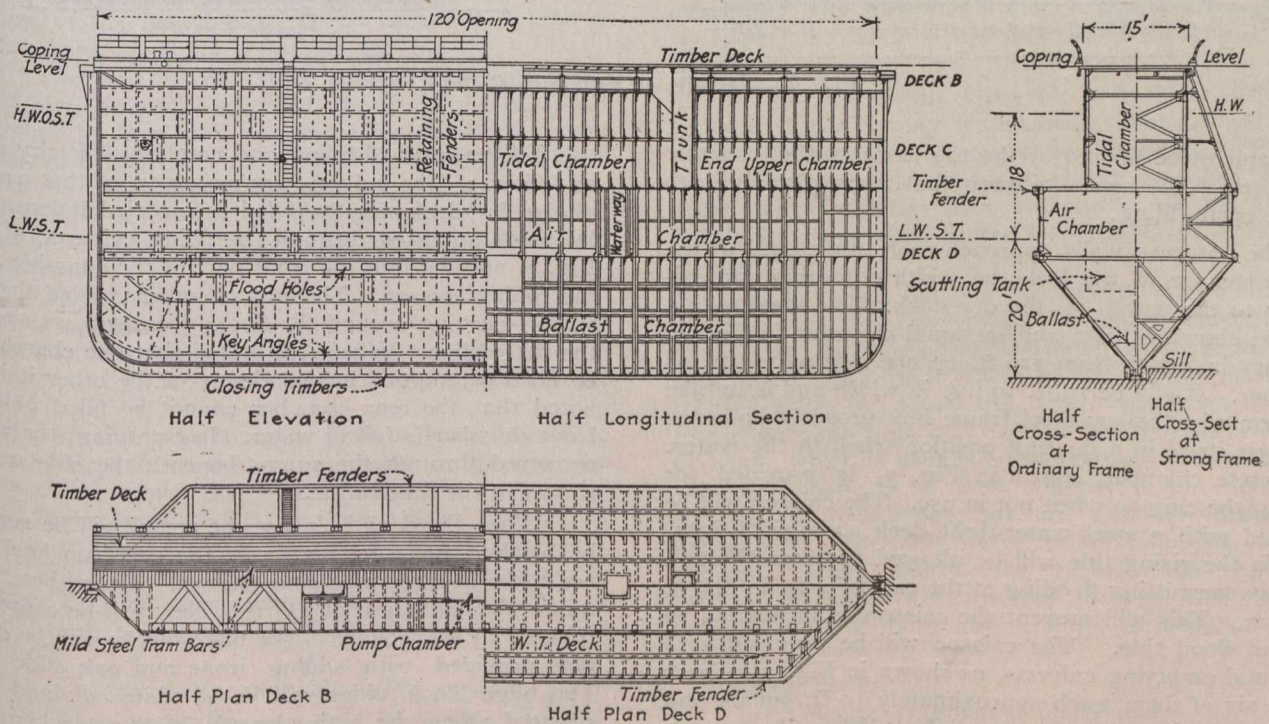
Elevation, Plan and Sections of Floating Caisson.
